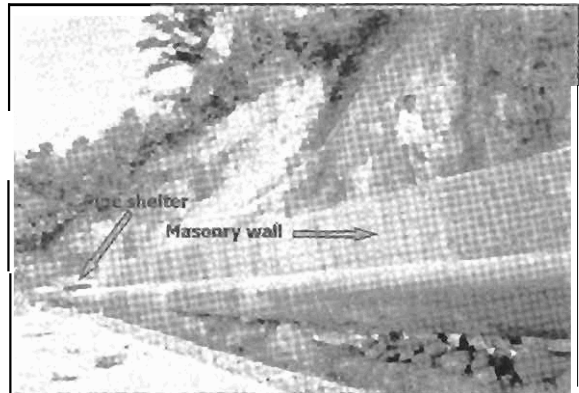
View along the Mahagdong-MGRD1B access road. Photo shows the newly constructed masonry wall. Also visible is the pipe shelter that was constructed to protect the pipeline from landslides.
